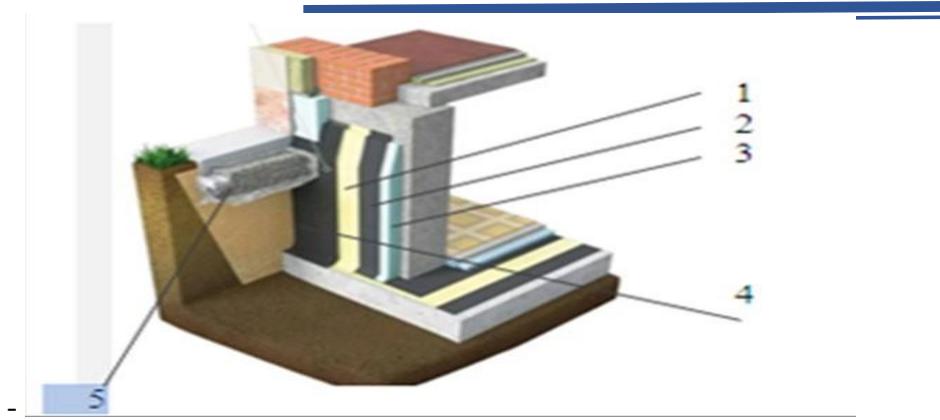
Foundation of a private strip-type house (ground floor) 1 - waterproofing, 2 - protective geotextile, 3 - thermal insulation, 4 - Izolit, 5 – Typar
